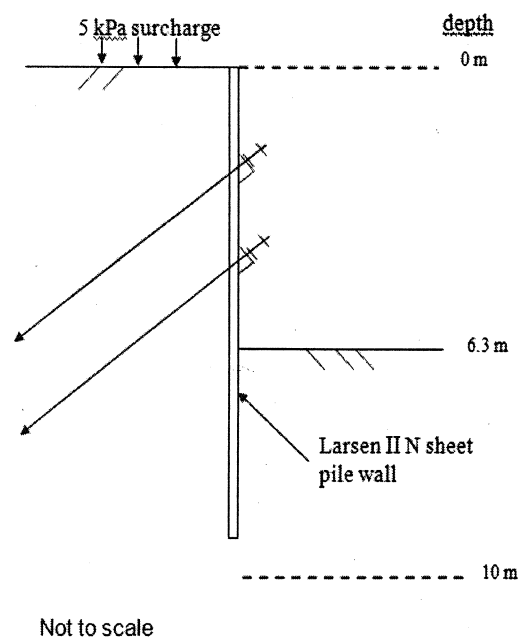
Cross section of wall panel at Manfred (modified from Stille 1976)
